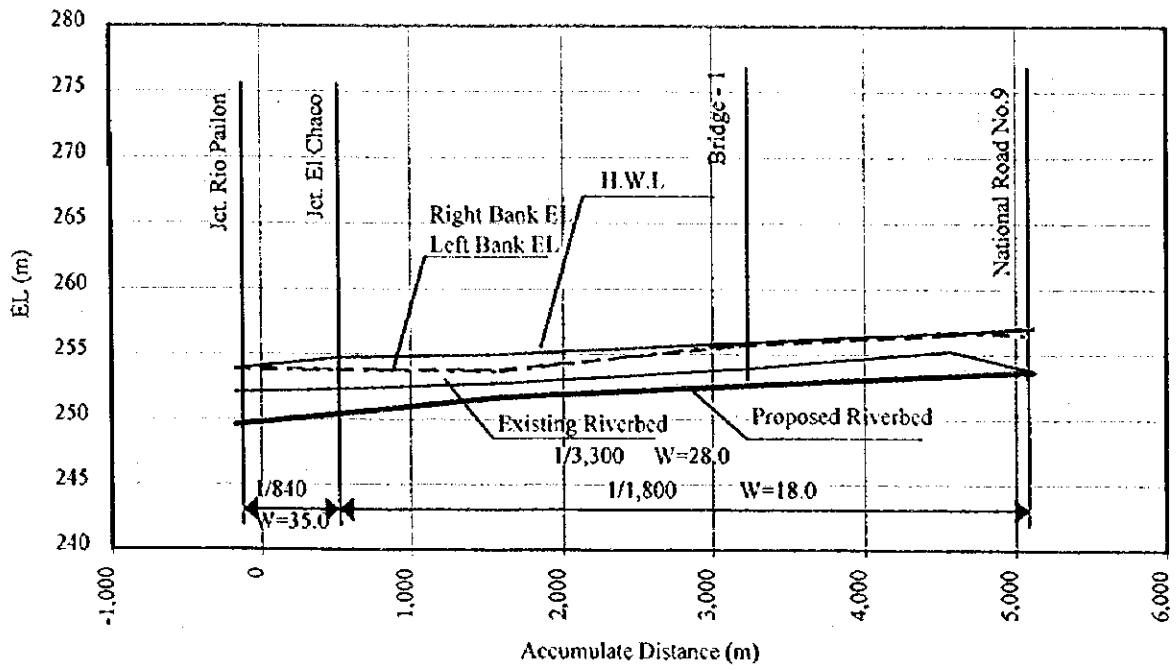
(1) LONGITUDINAL PROFILE OF DRAINAGE IMPROVEMENT
